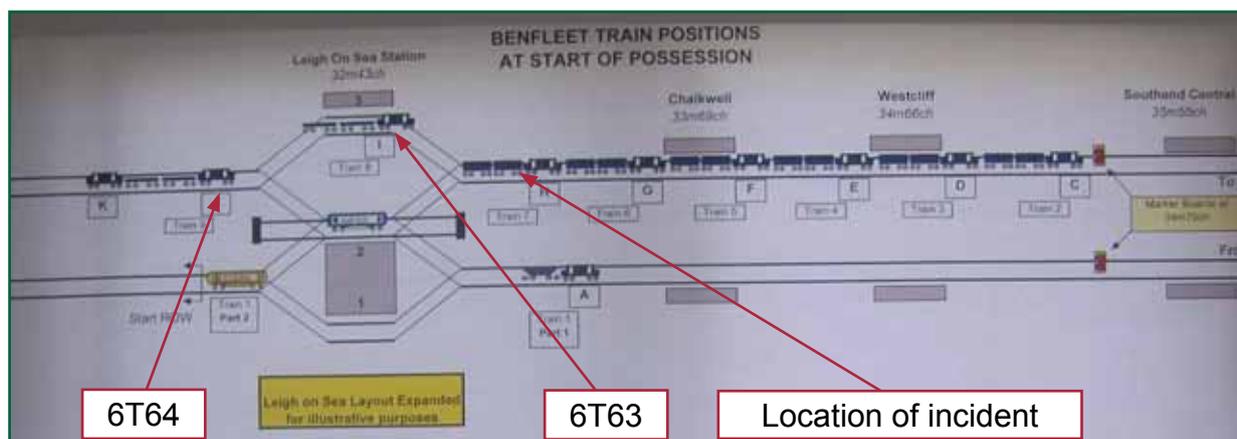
Photograph of the possession plan used for site briefings at the booking on point at Leigh-on-Sea
